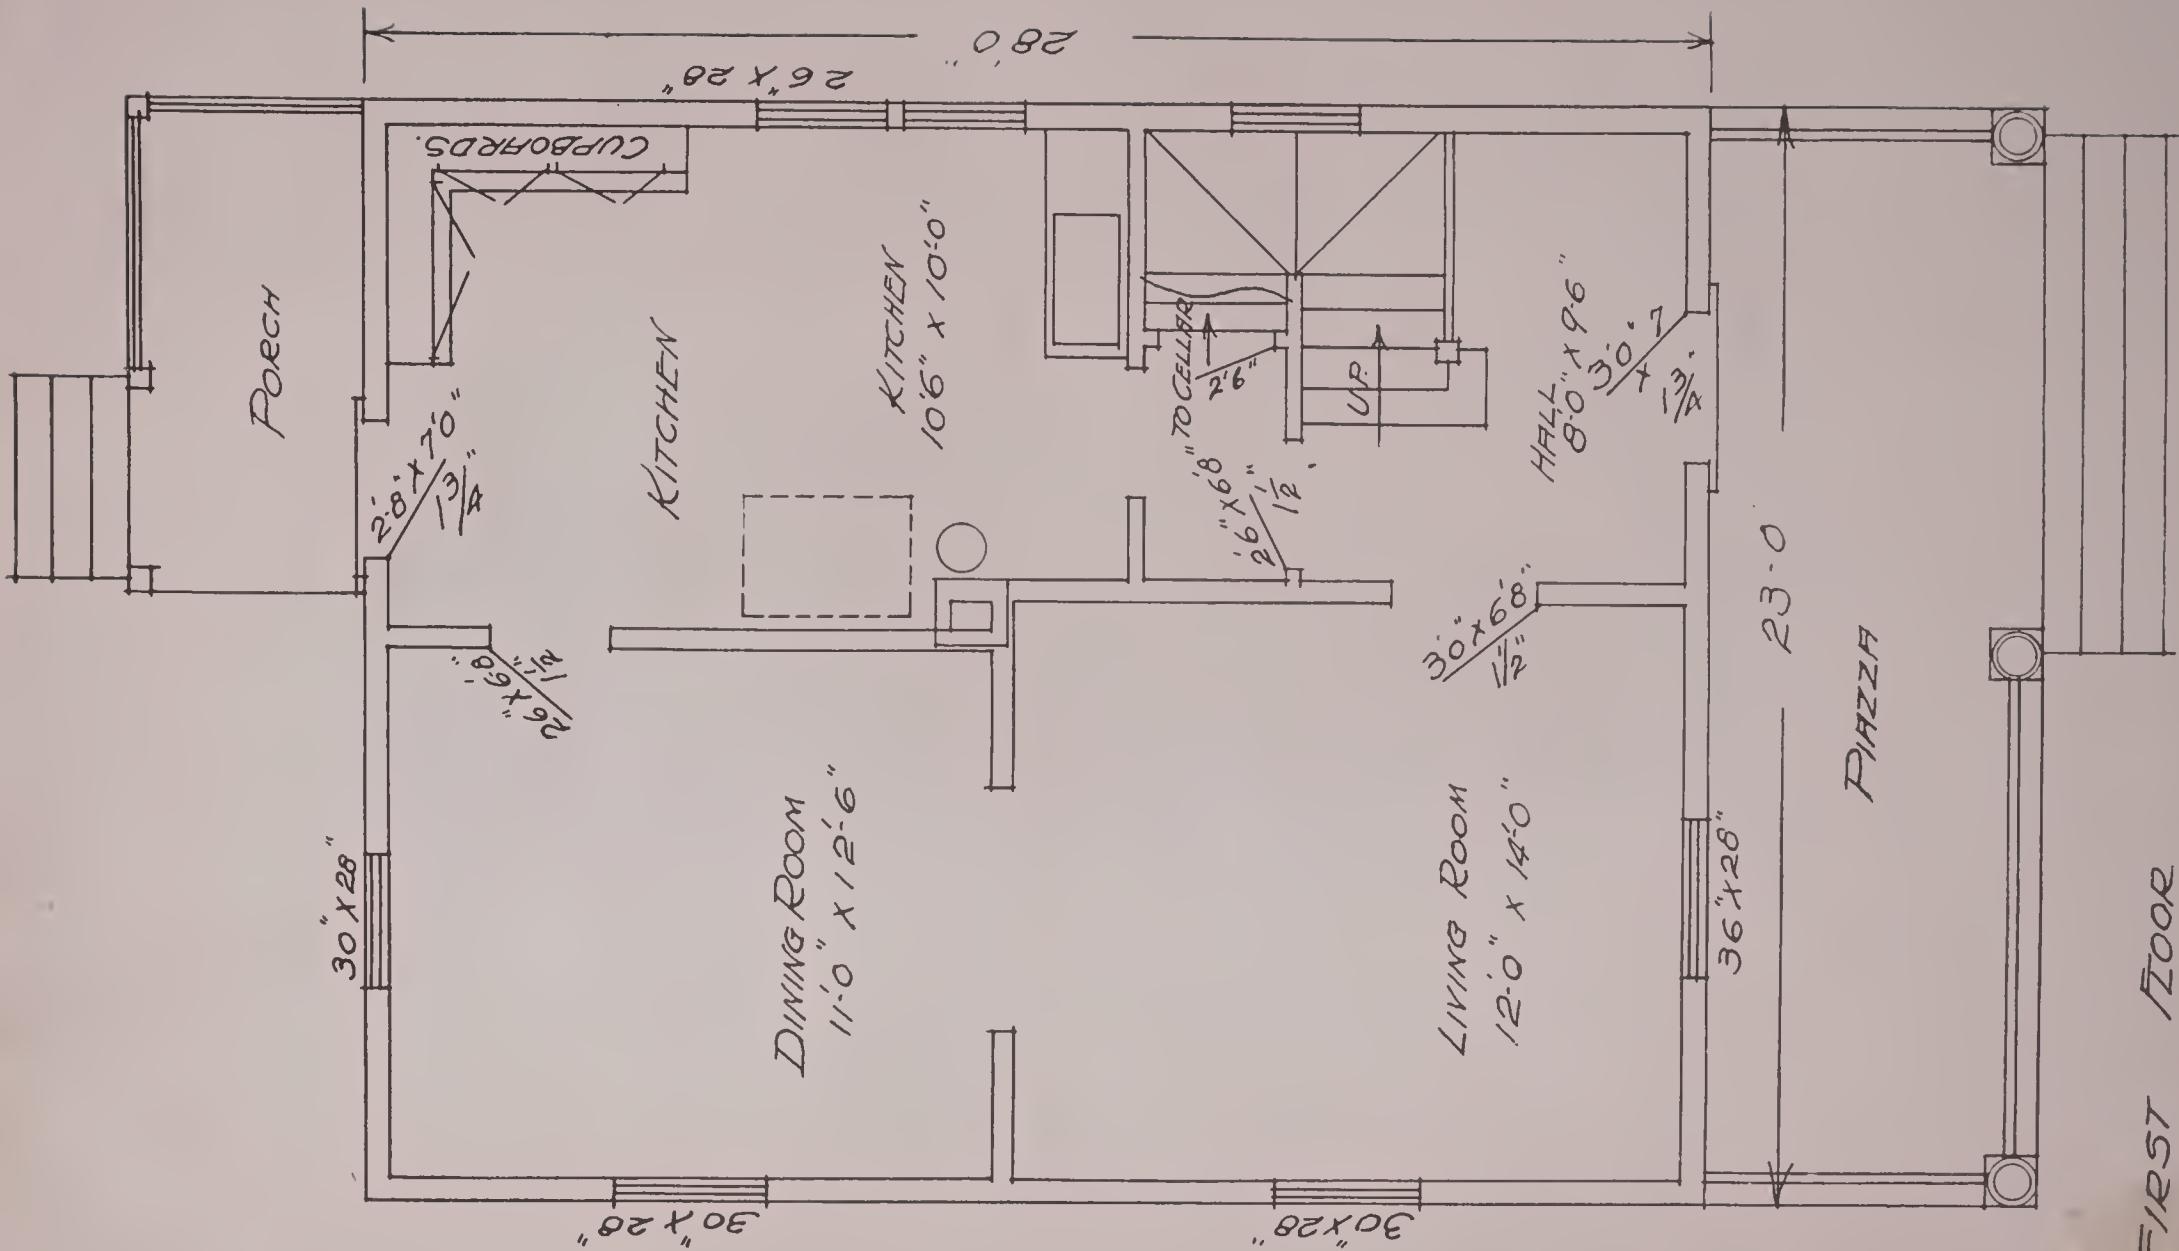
PLATE Ia.—First floor plans of house erected by the Rockton Realty Company at Amsterdam, N. Y. Elevations shown in Plates I, II and III.
